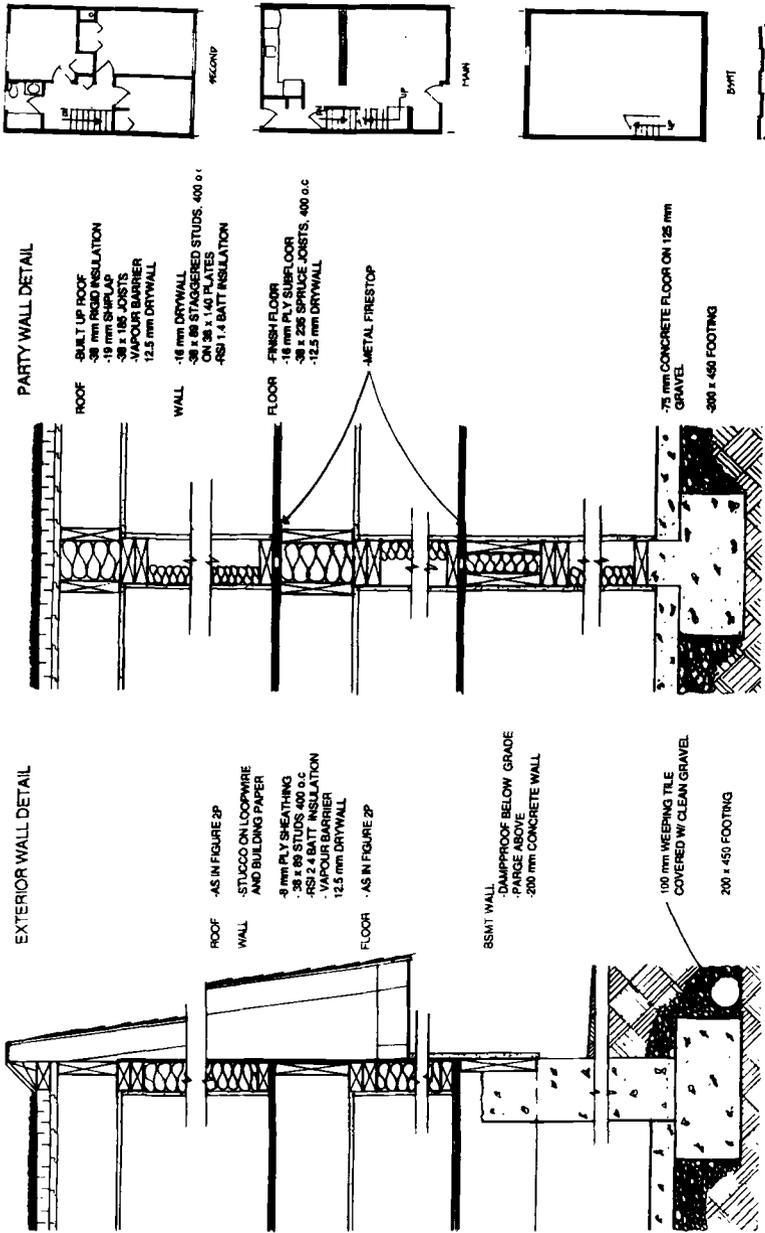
Exterior wall section, party wall section, and floor plans for Project 2.
